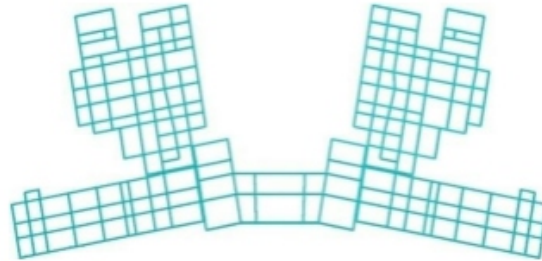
Plan of the Academic building of the ICAFI University, Tripura modeled in STAAD Pro V8i
